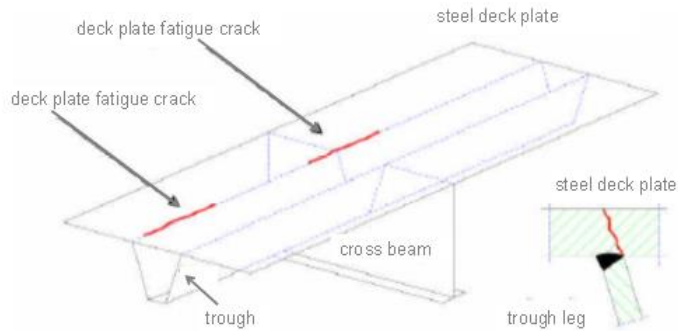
Type 4: Deck plate crack (Dooren, F. van)
